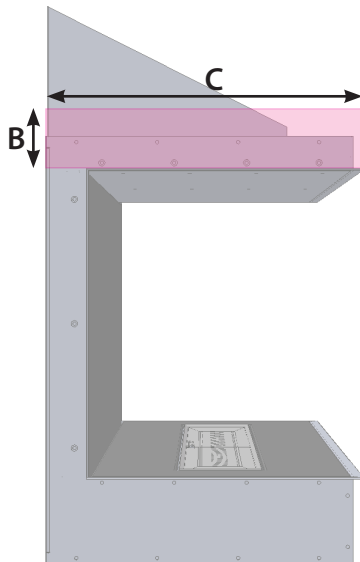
NON-Combustible Facing Dimensions (Left Side)
